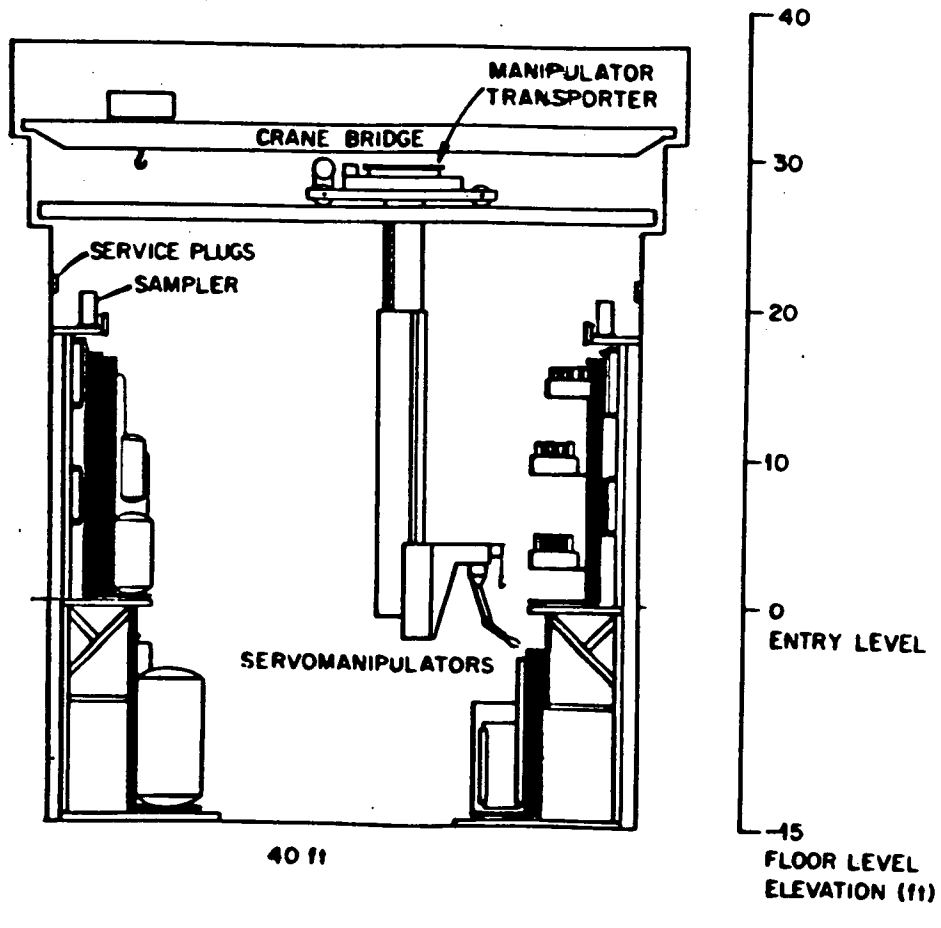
Cross section of Breeder Reprocessing Engineering Test
